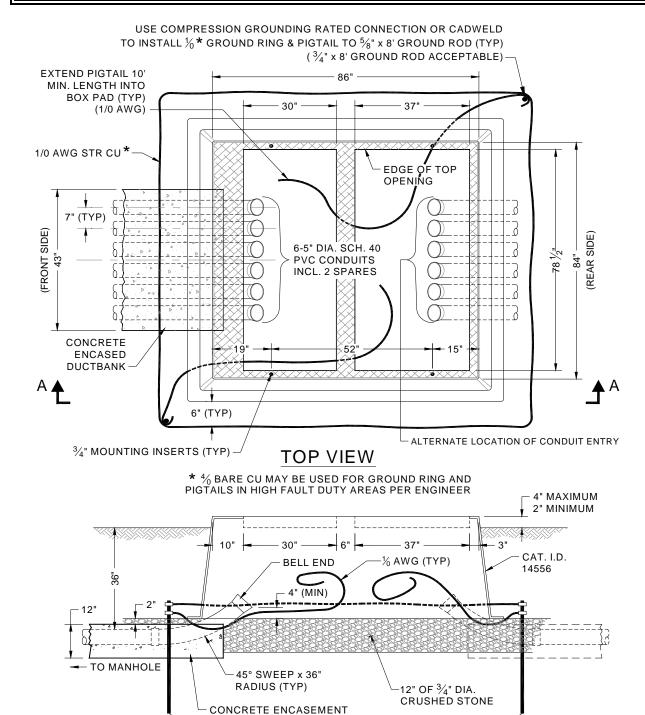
Typical Fiberglass box Pad Installation Details to support 25kV PME-9 Switches
